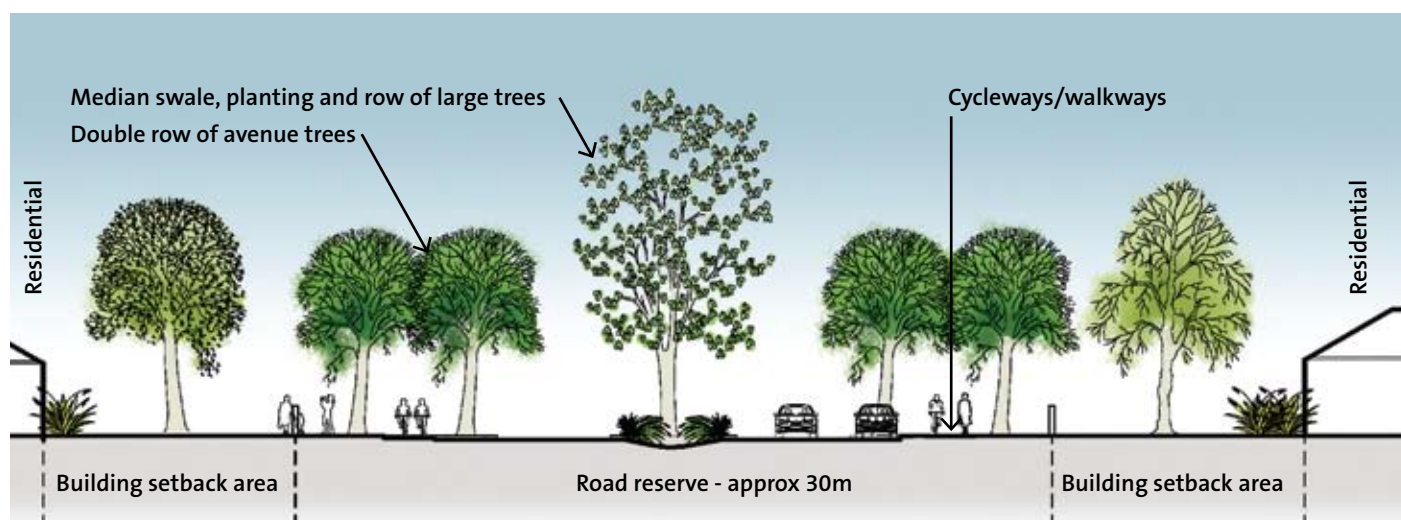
Indicative Cross-Section through Rural to Urban Avenue sections - 1:300
